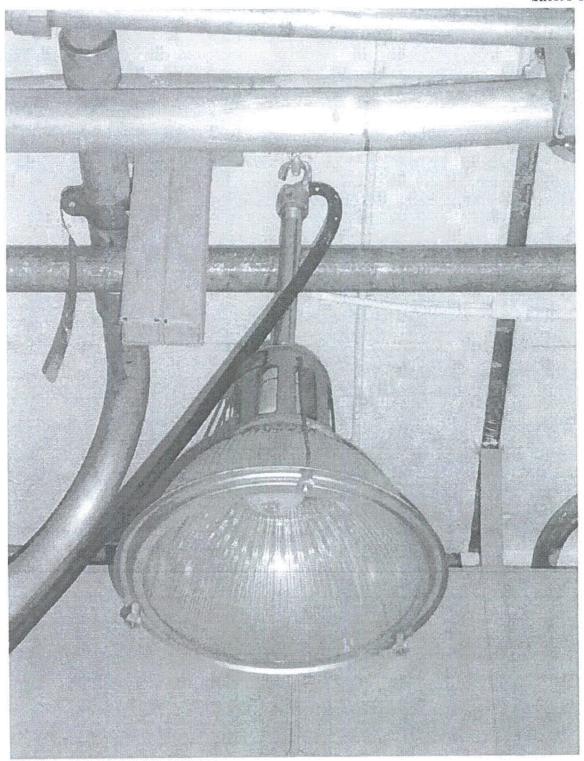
Hanging Rod with Open Hook (Room C-114)
